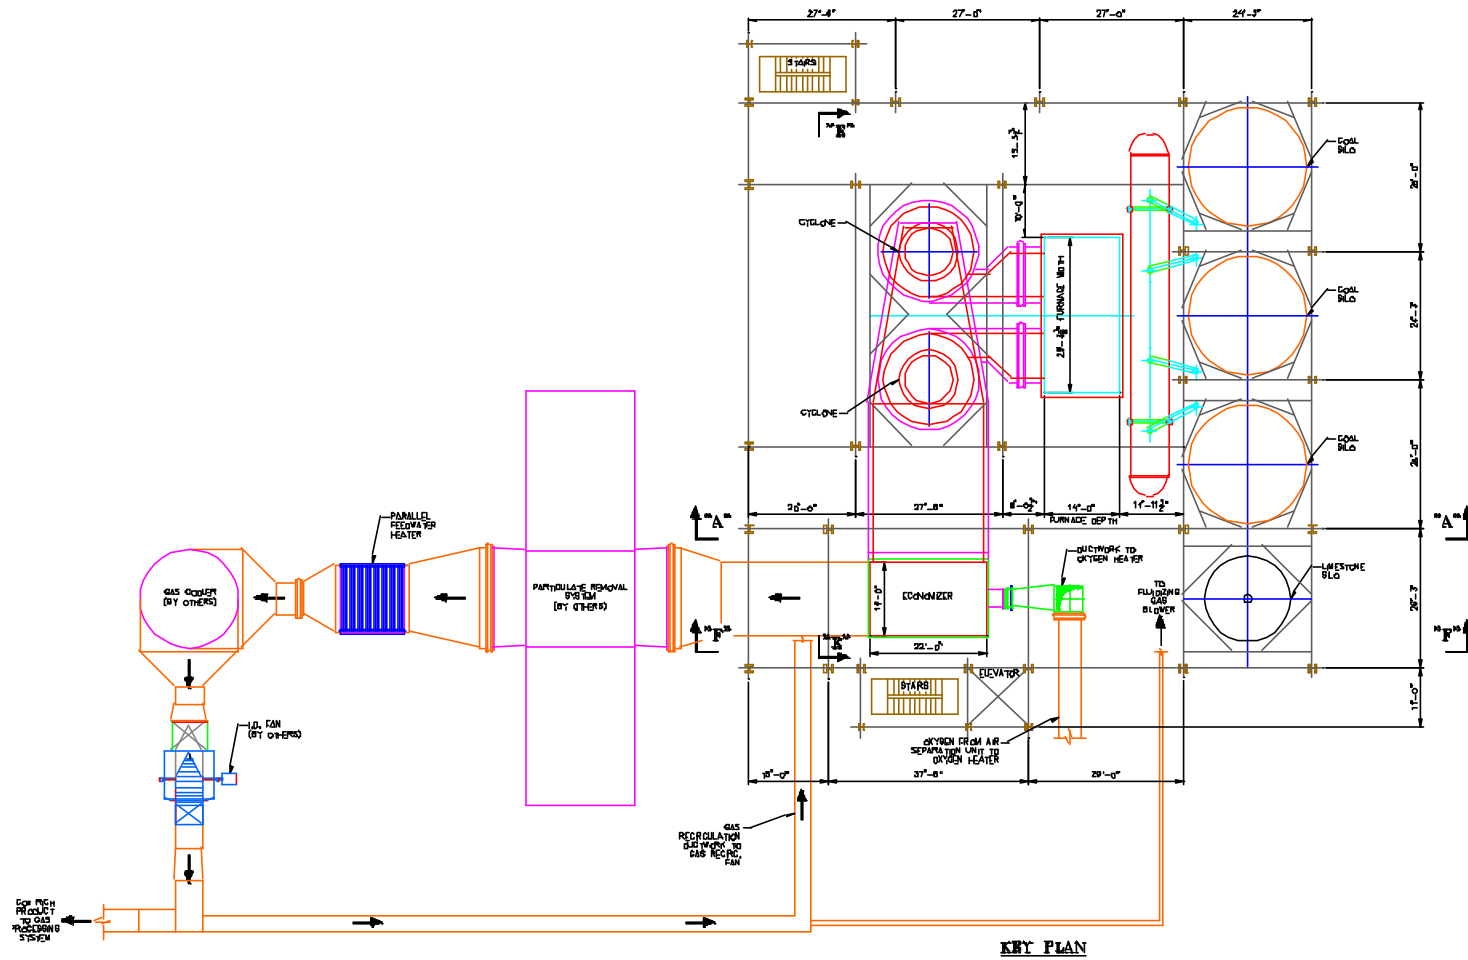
4: Case-2 Boiler Island General Arrangement Drawing - Plan View
